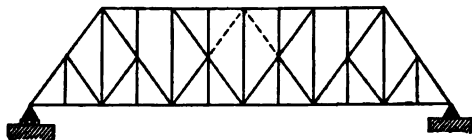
Sub-divided Pratt Truss commonly known as the Baltimore Truss. to subdivide the truss by a secondary system, as indicated in Figs. 132 and 133, though such a sub-division causes, in some of the members, secondary stresses of considerable magnitude.
